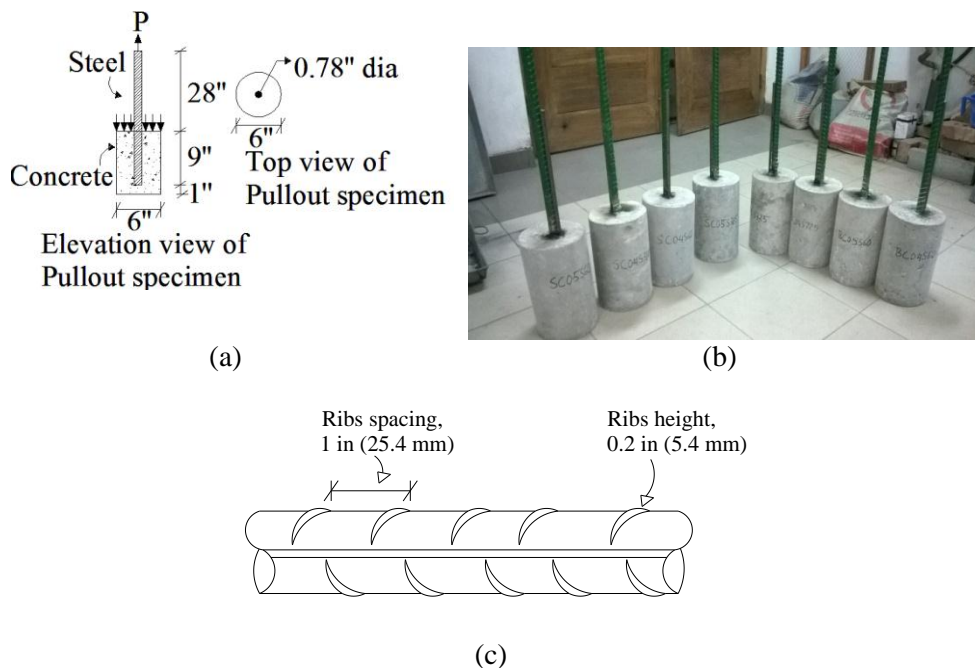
(a) Pullout specimen details, (b) All casted pullout specimens and (c) Details of steel rebar specimen
